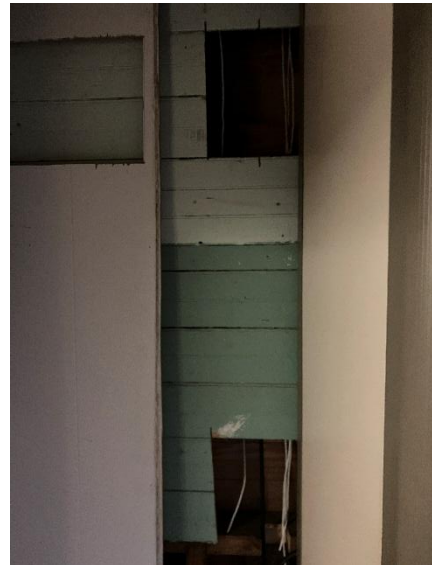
Dark green paint, wood wall, south sanctuary entrance, main floor
